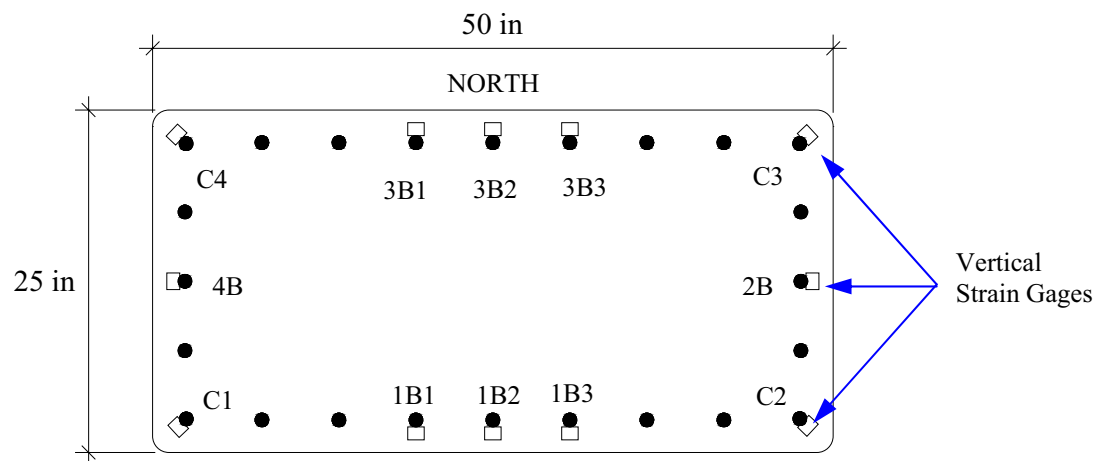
Section A-A; Strain Gages Location on Longitudinal Steel; Specimens H1 & H2
